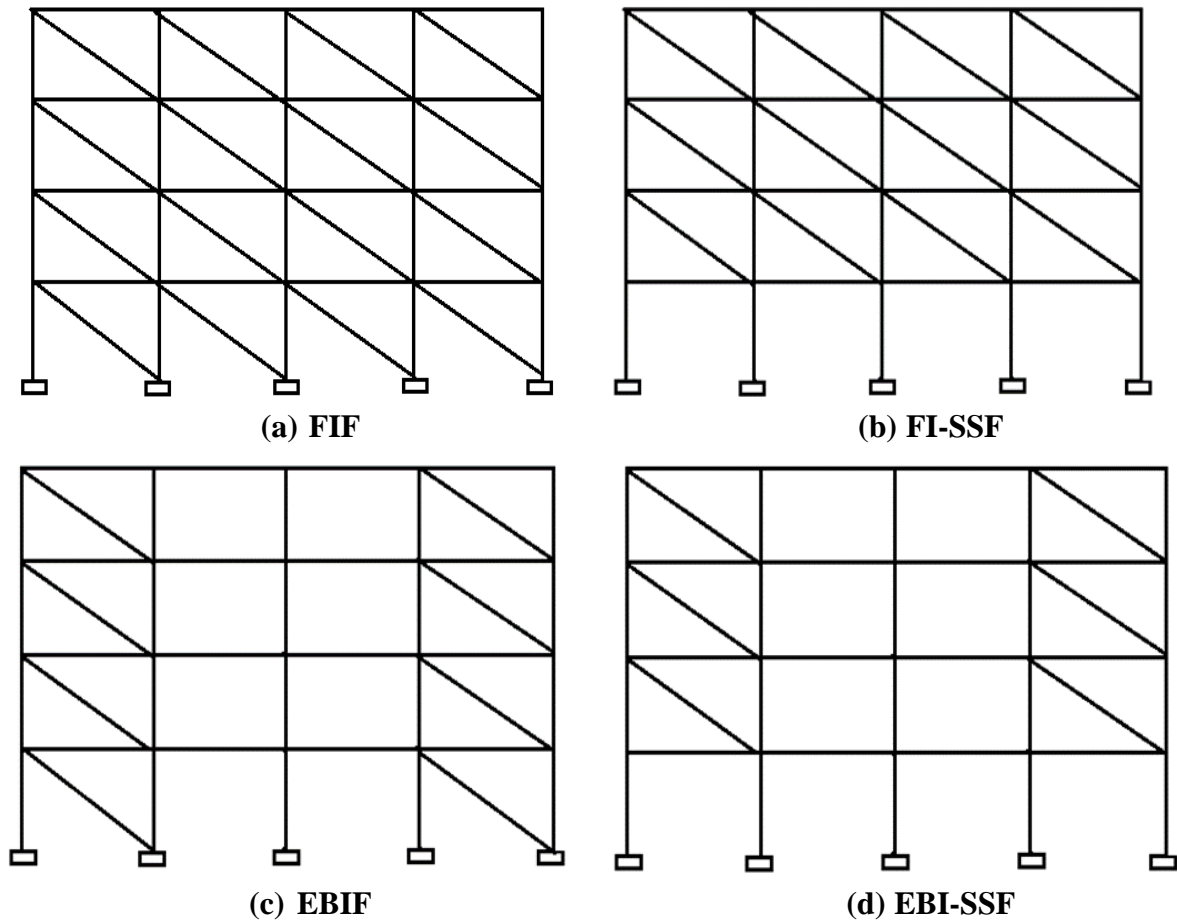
An example model of different arrangements of infill walls for 4 storey-4 bay frames
